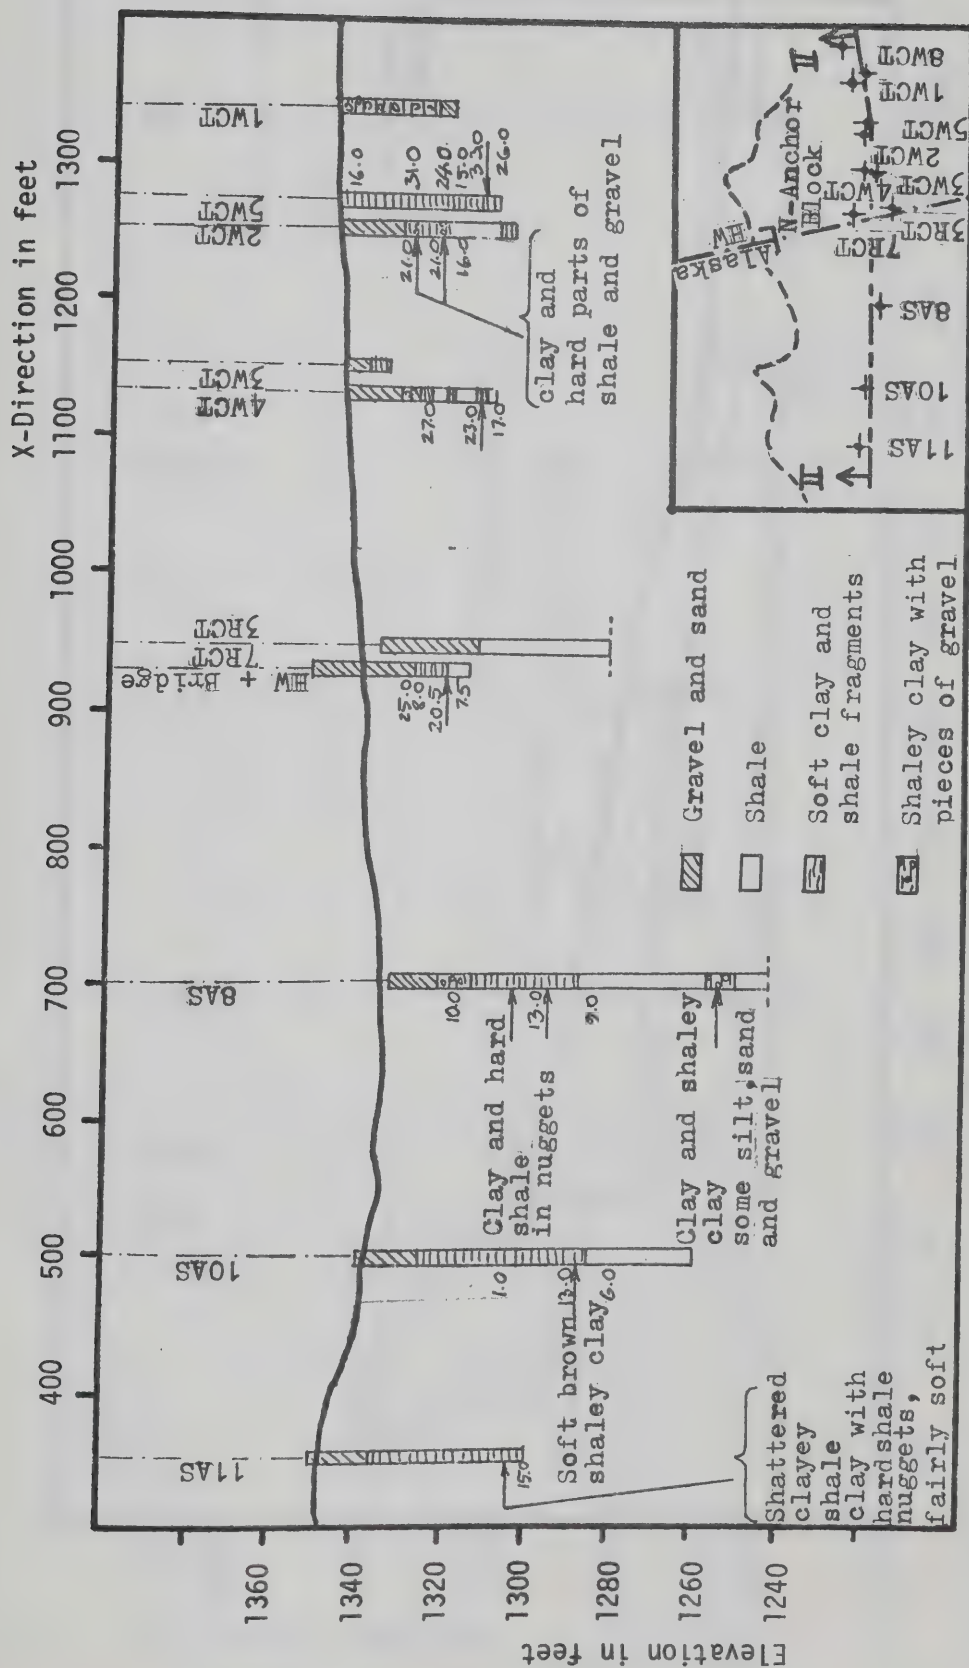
FAILURE OF PEACE RIVER BRIDGE AT TAYLOR, B.C.:
